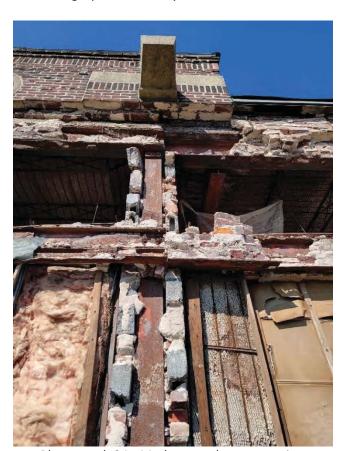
Heavily corroded steel beam and relief angle.
